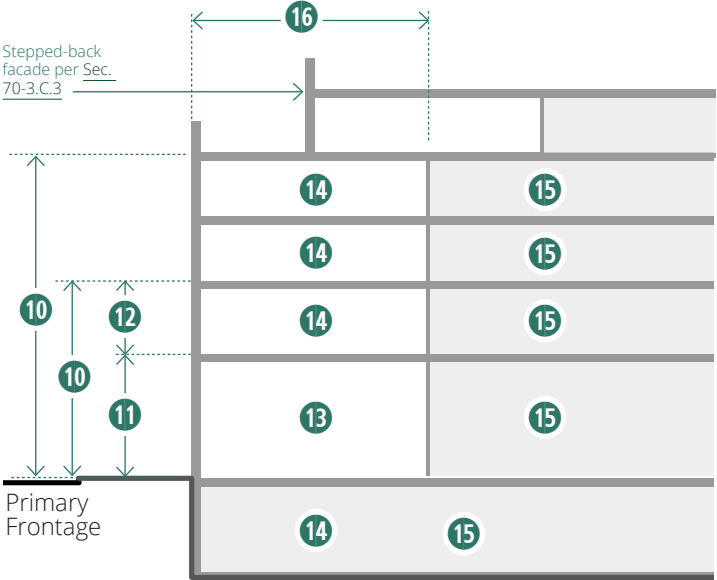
C-3. Storefront Building Section: Height & Use Requirements
